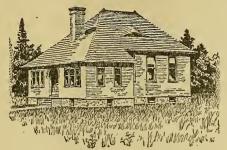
Elevation of Model One-room Schoolhouse. First Prize Design.
